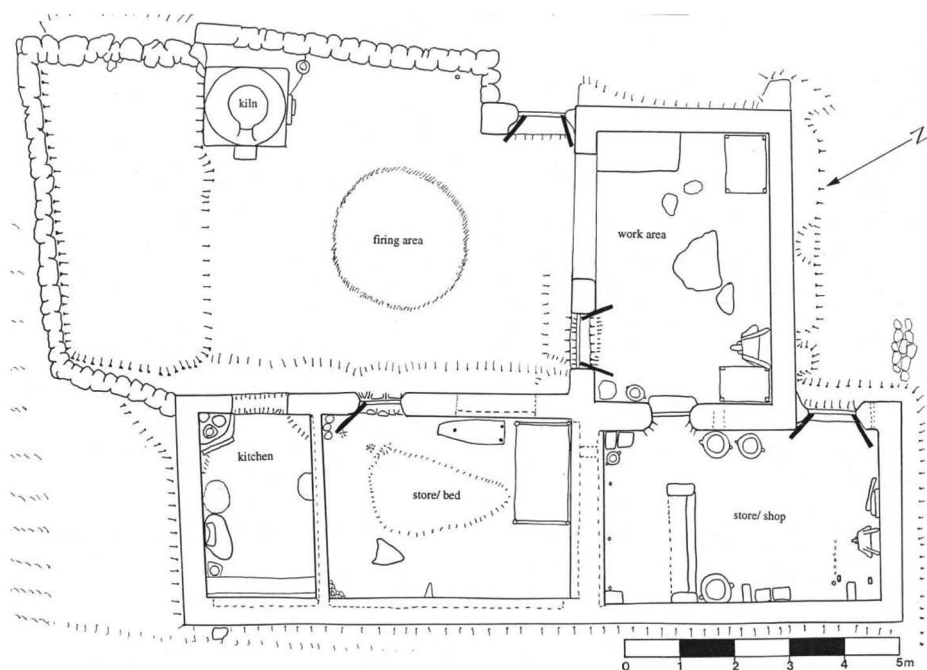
Plan of Maximo Amaru's house (1990). © Drawing: Bill Sillar.
